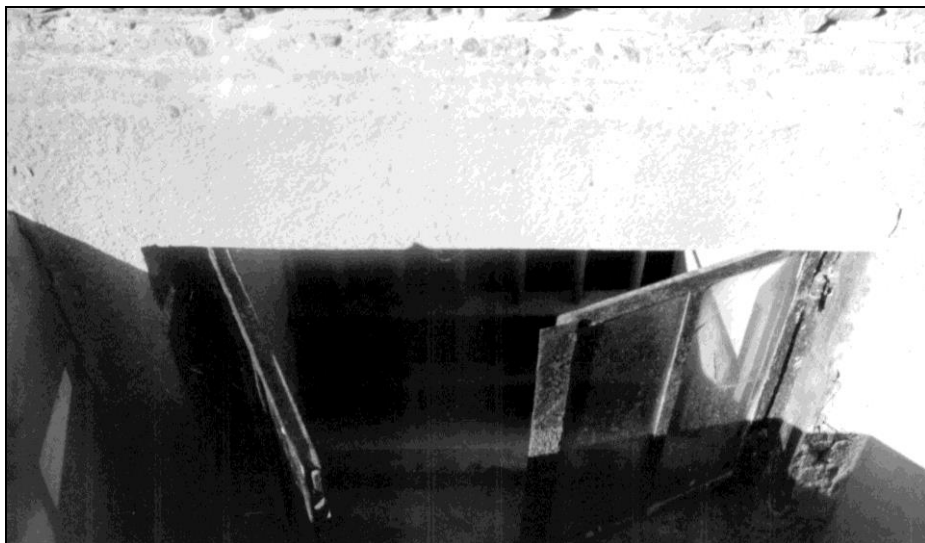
Block 11, outside, wall facing NNE, window of one of the bunker cells surrounded by a concrete cover.
